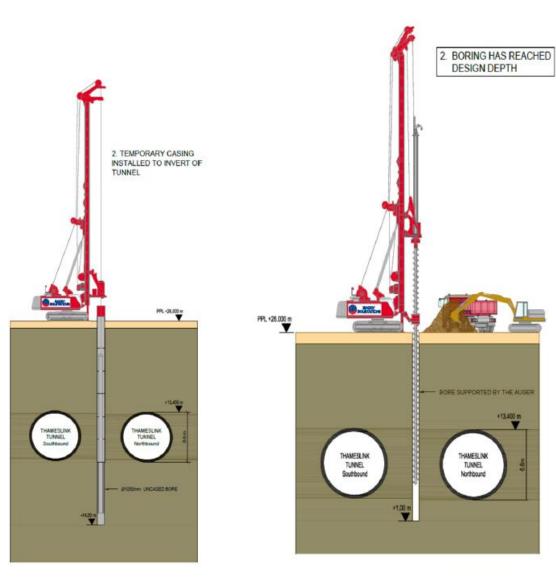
Pile Arrangement Adjacent to Tunnels
